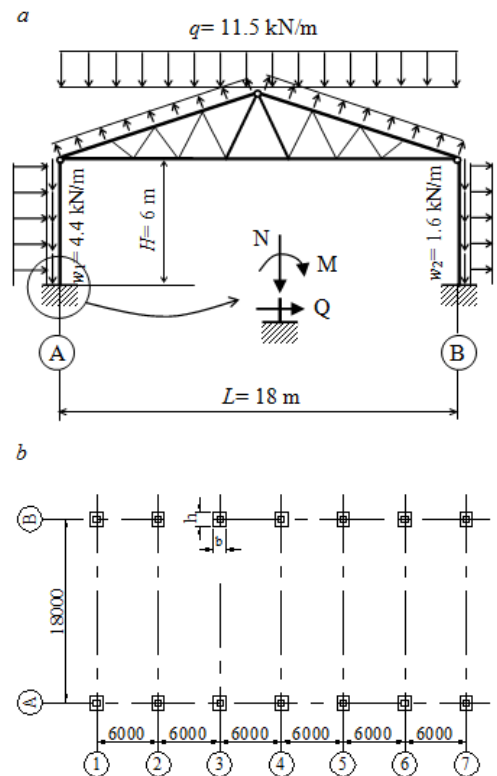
Design model of test building: *a*- design model of planar bearing frame, *b*- plan of column foundations
